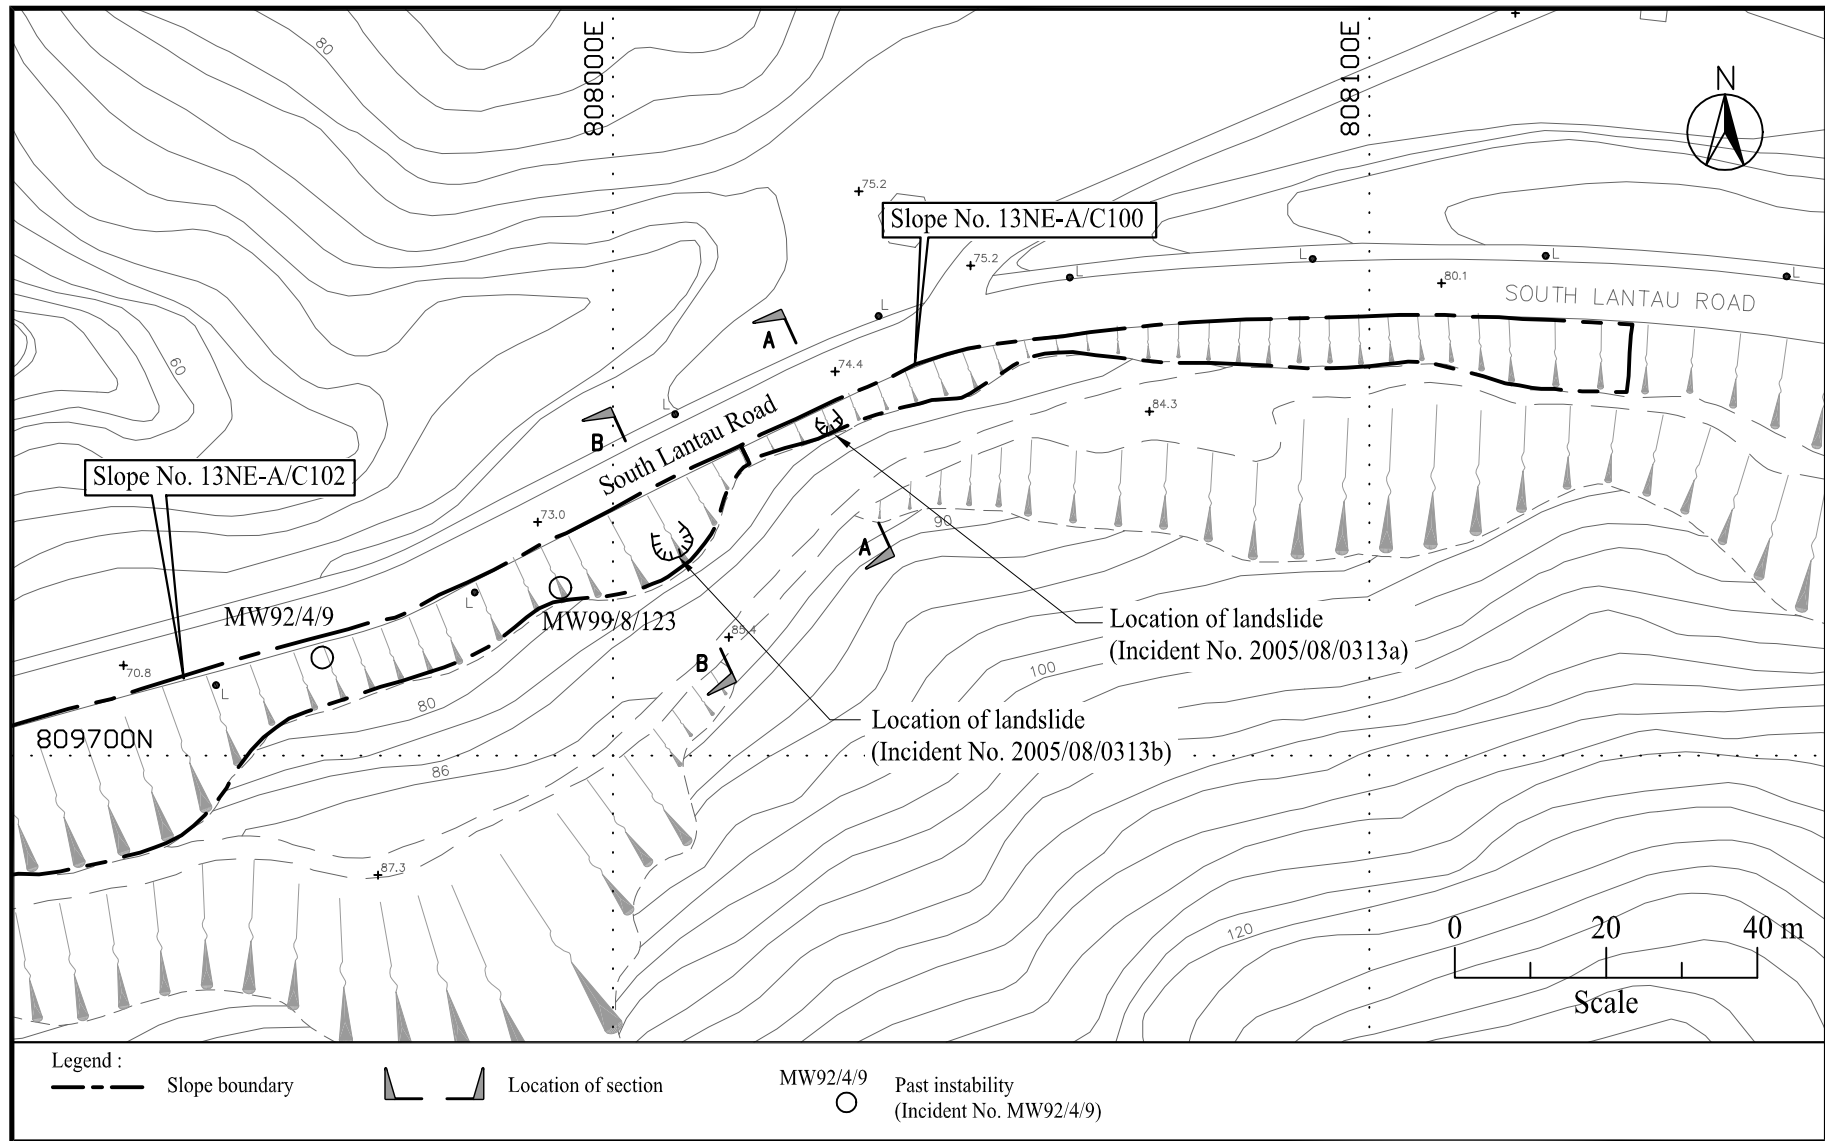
Site Plan (Slope Nos. 13NE-A/C100 and 13NE-A/C102)
